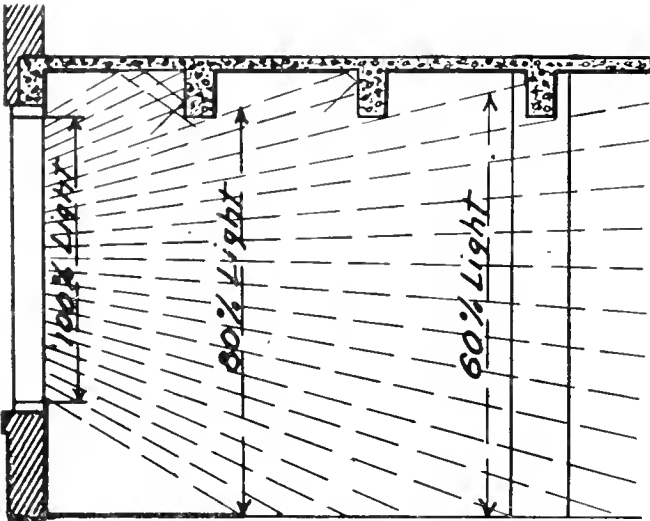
Beam and Girder System. Light Rays Reflected by Ceiling are Pocketed by Beams.
